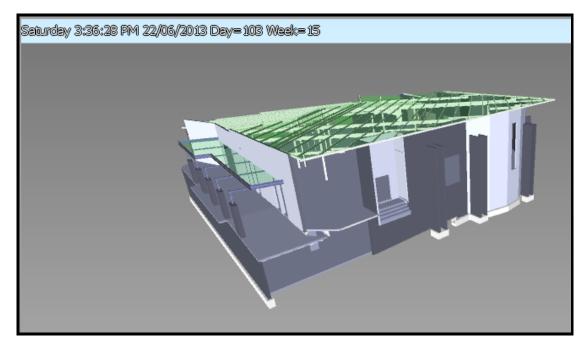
Building Approval Stage (Viewpoint 1) - Works Complete Week 15
